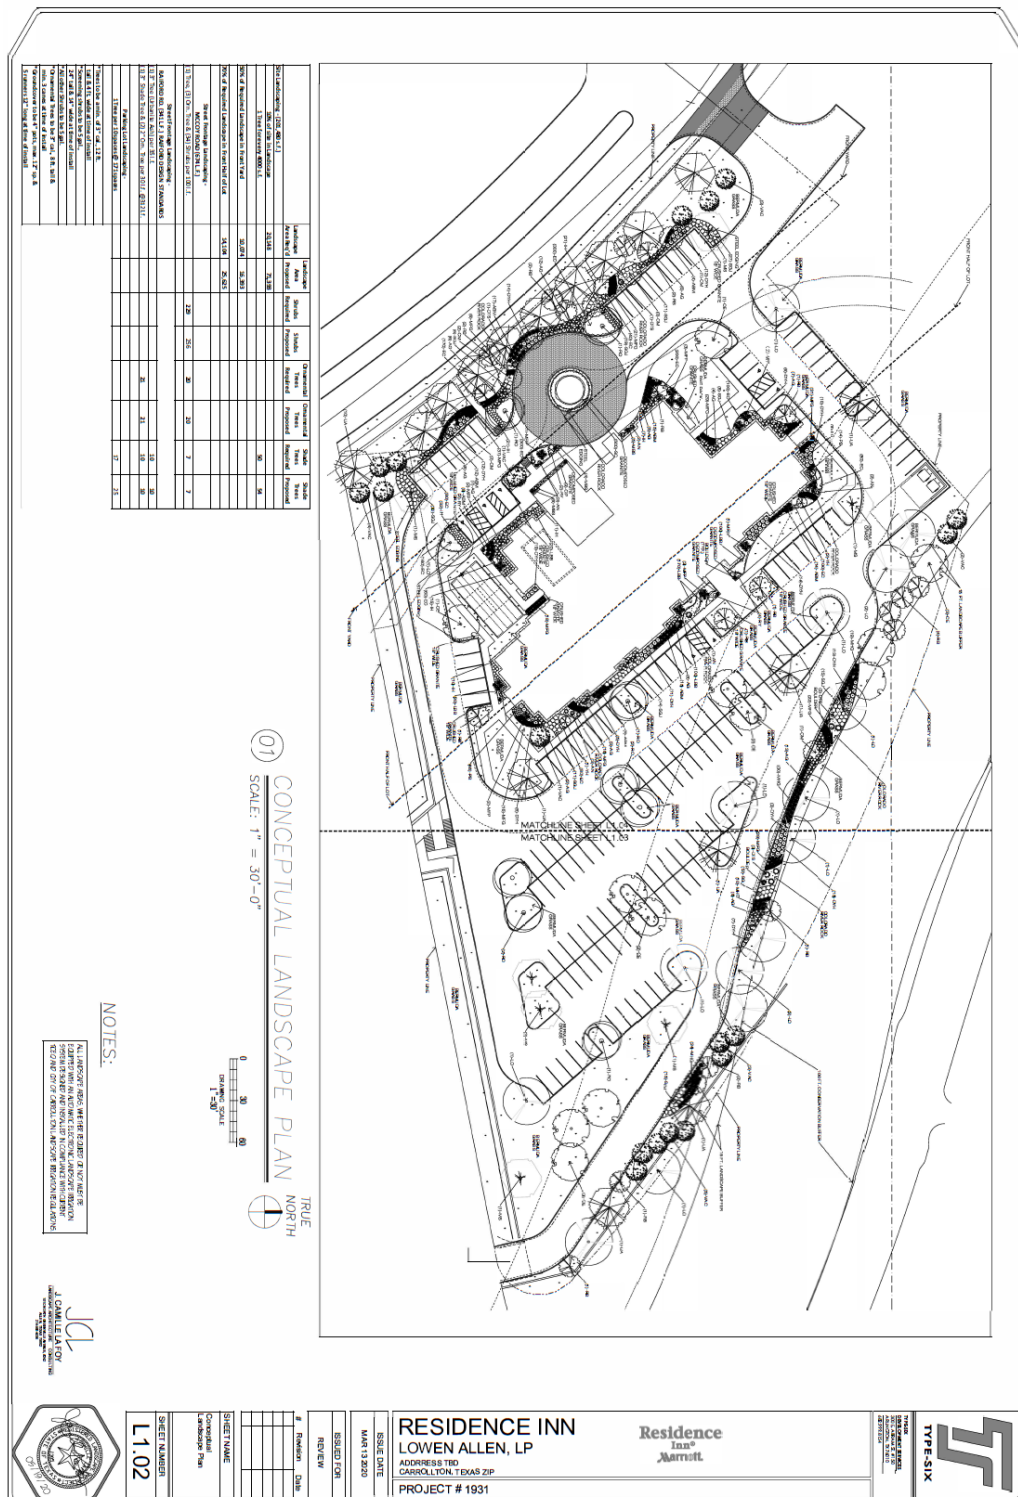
EXHIBIT D CONCEPTUAL LANDSCAPE PLAN (2 of 3)
